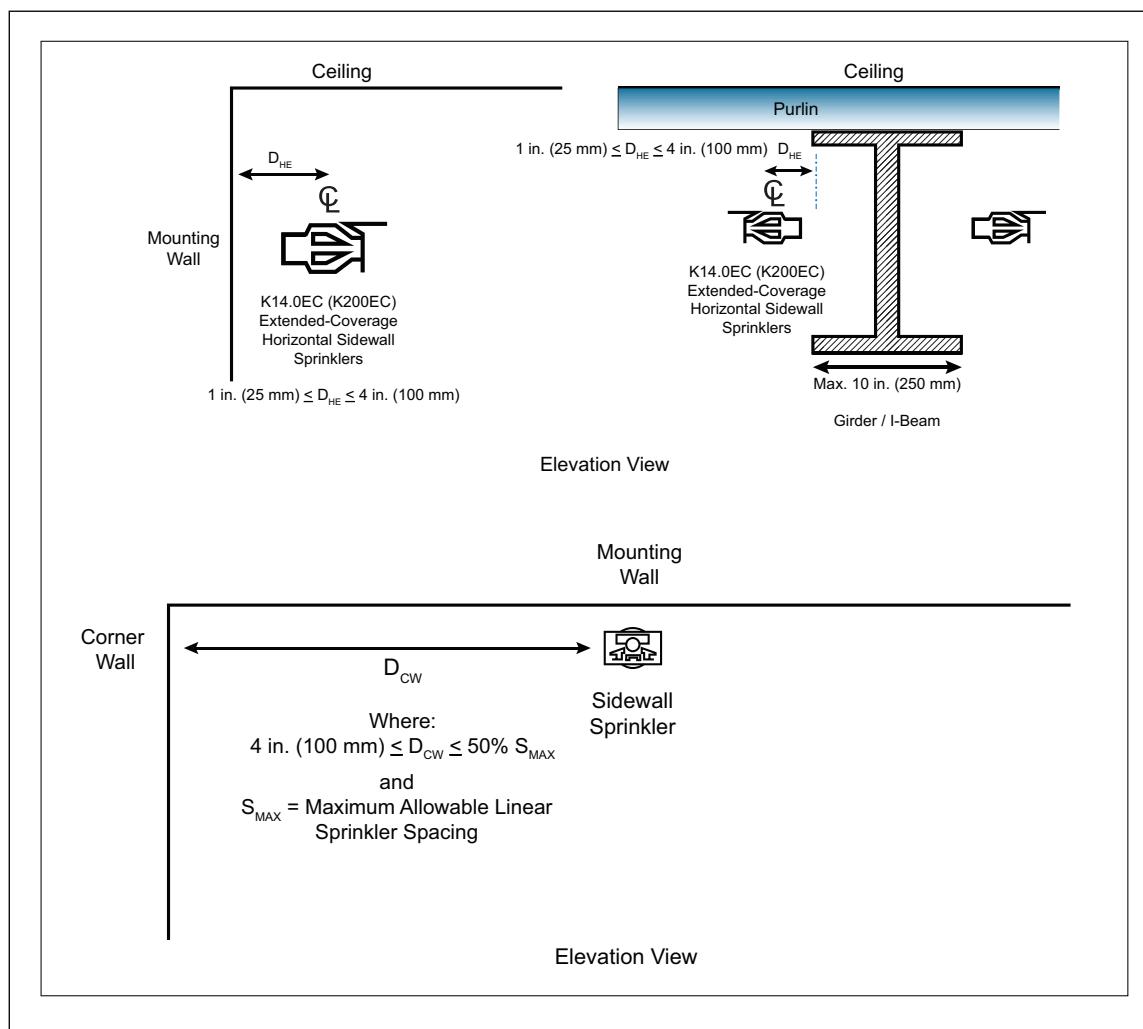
Horizontal distances from Nonstorage K14.0EC (K200EC) horizontal sidewall sprinkler to walls
